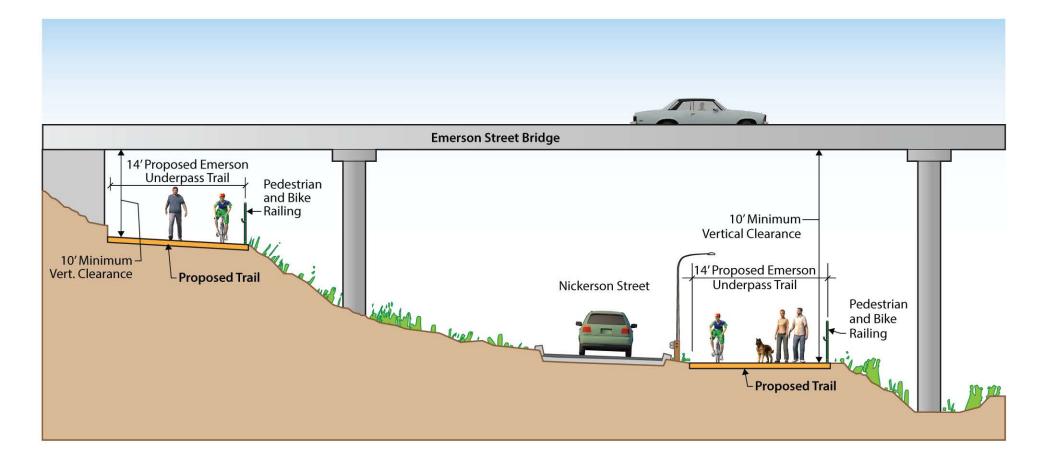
Emerson Underpass Trail - Section 3 (STA 14+80)
